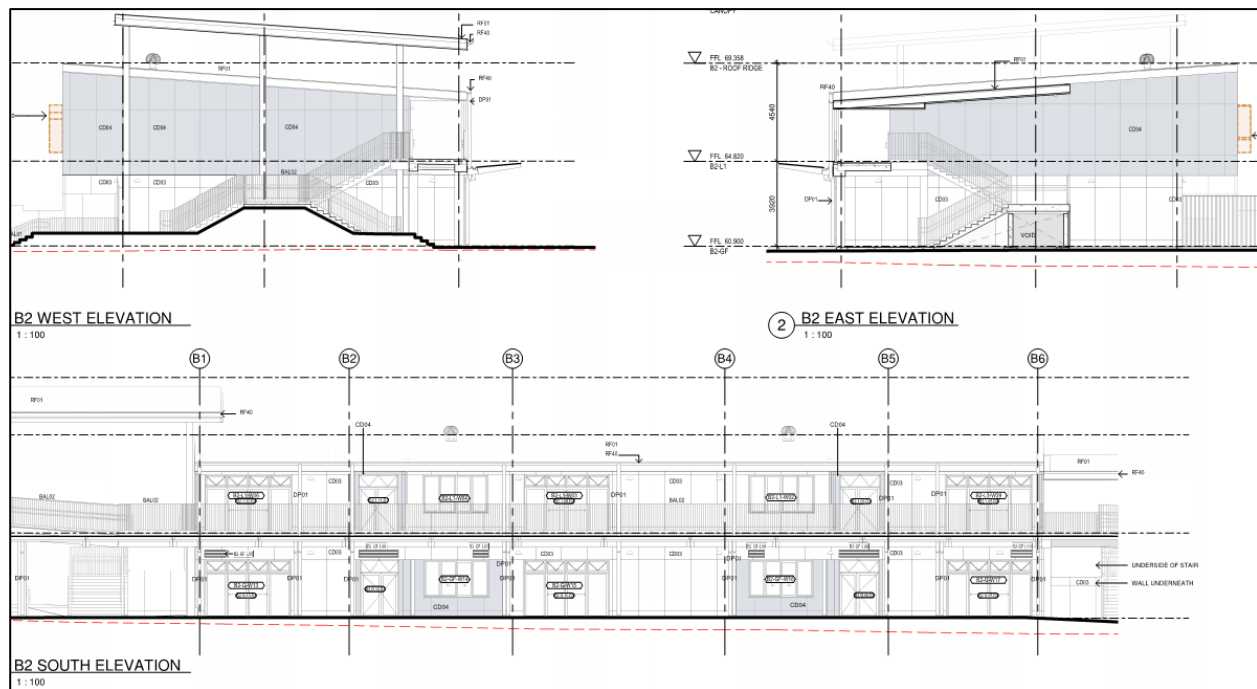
Building B2 shows the typical use of CFC Barestone cladding used as the main wall cladding across all the elevations for the buildings. CD03/04 are the identical Barestone product with different colours.
